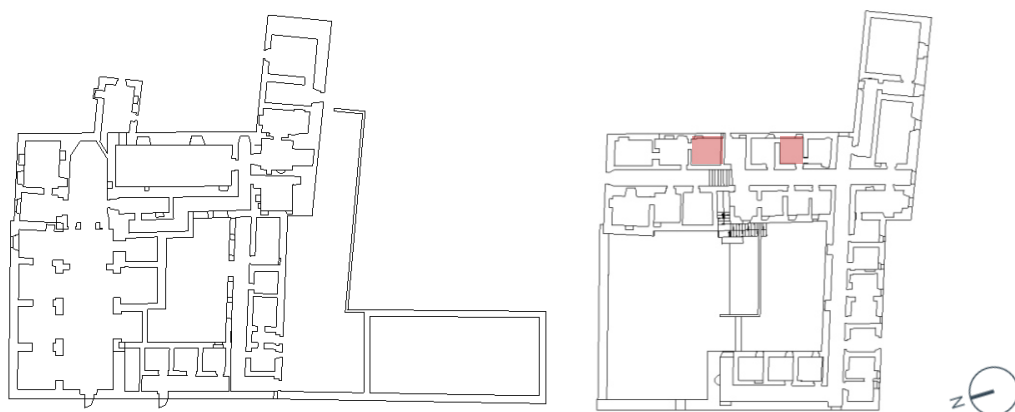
Planimetry: ground floor (on the left), first floor (on the right)
